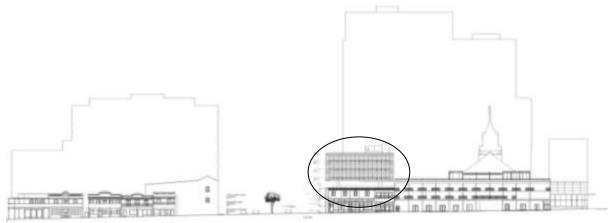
Waterkant Street elevation of the proposal shown in relation to its surroundings
